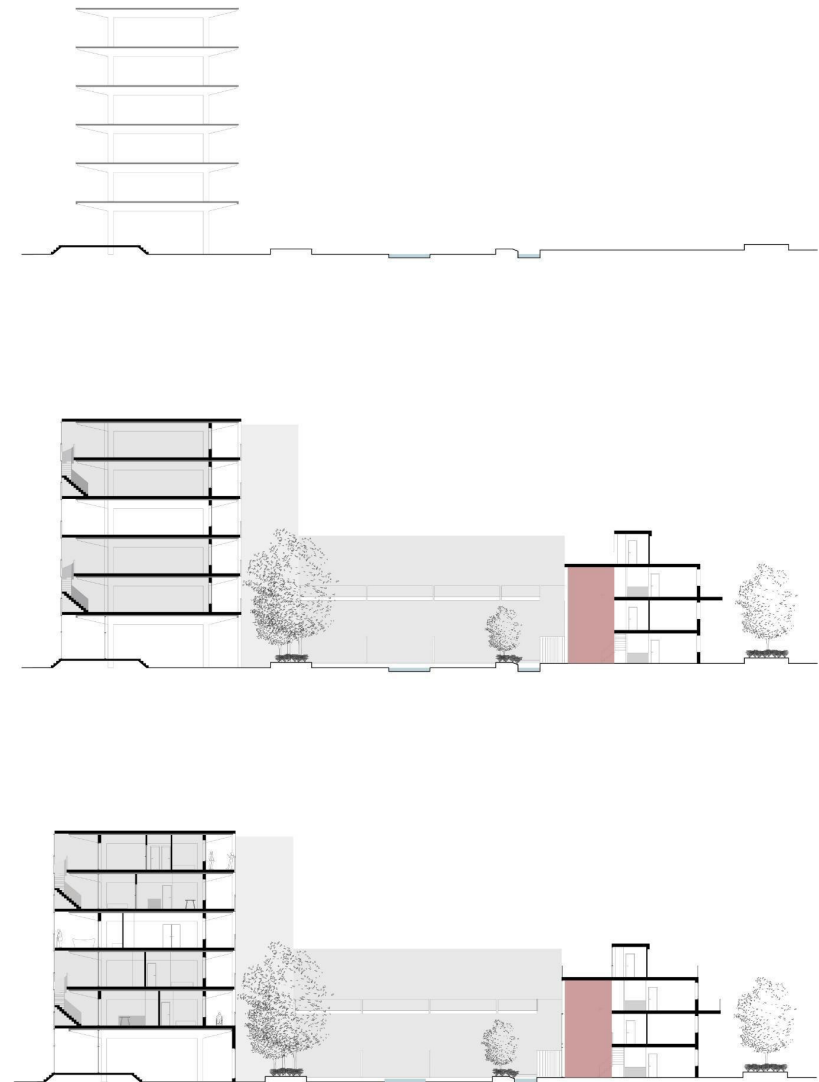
Section. Top: Existing re used structure. Middle: Non-adaptable elements. Bottom: Adaptable infill.
